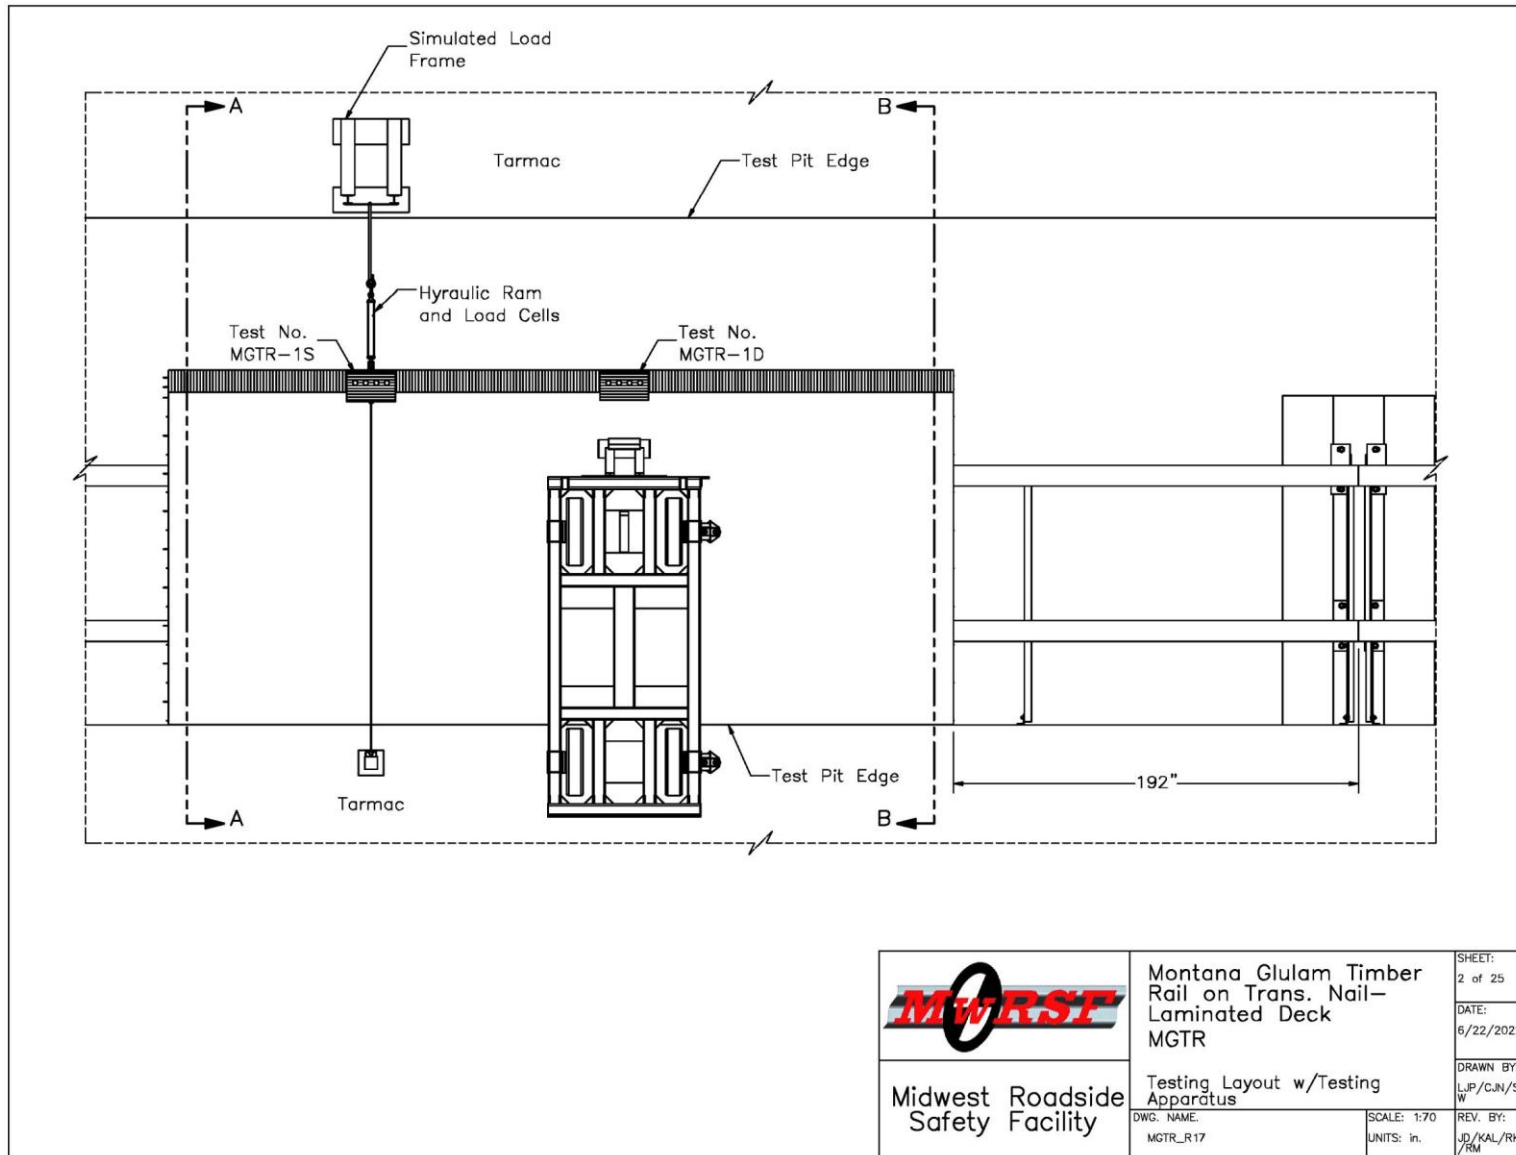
Transverse, Nail-Laminated, Timber Deck and Test Nos. MGTR-1S and MGTR-1D System Layout
